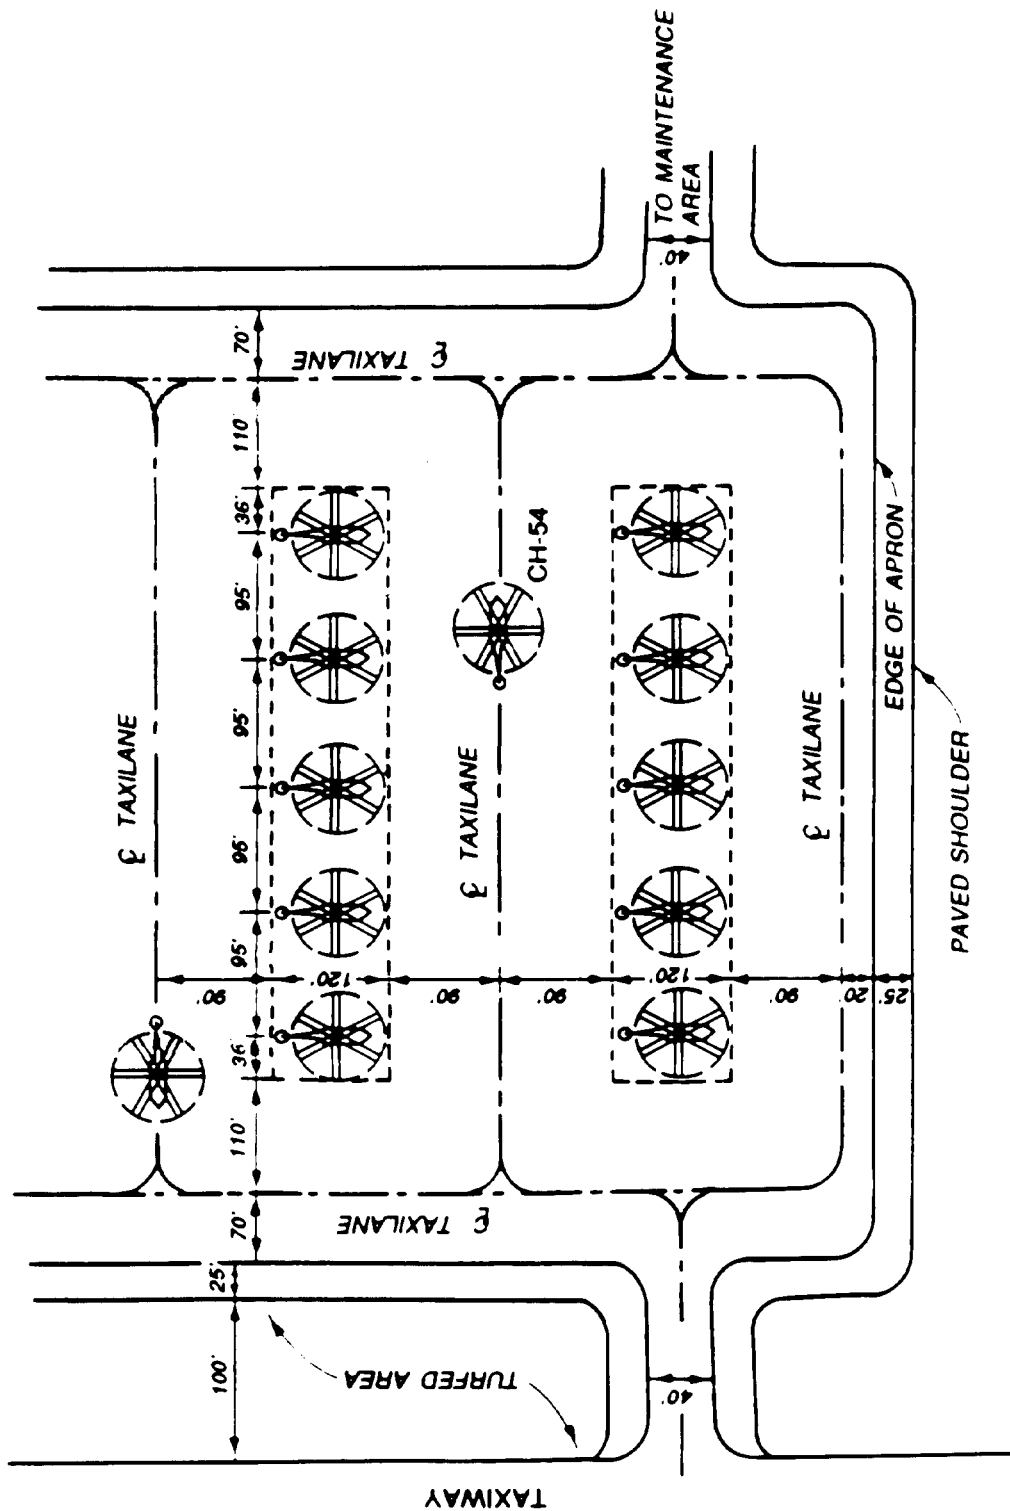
CH-54 Parking Plan, Type 1 (Single Lane)
